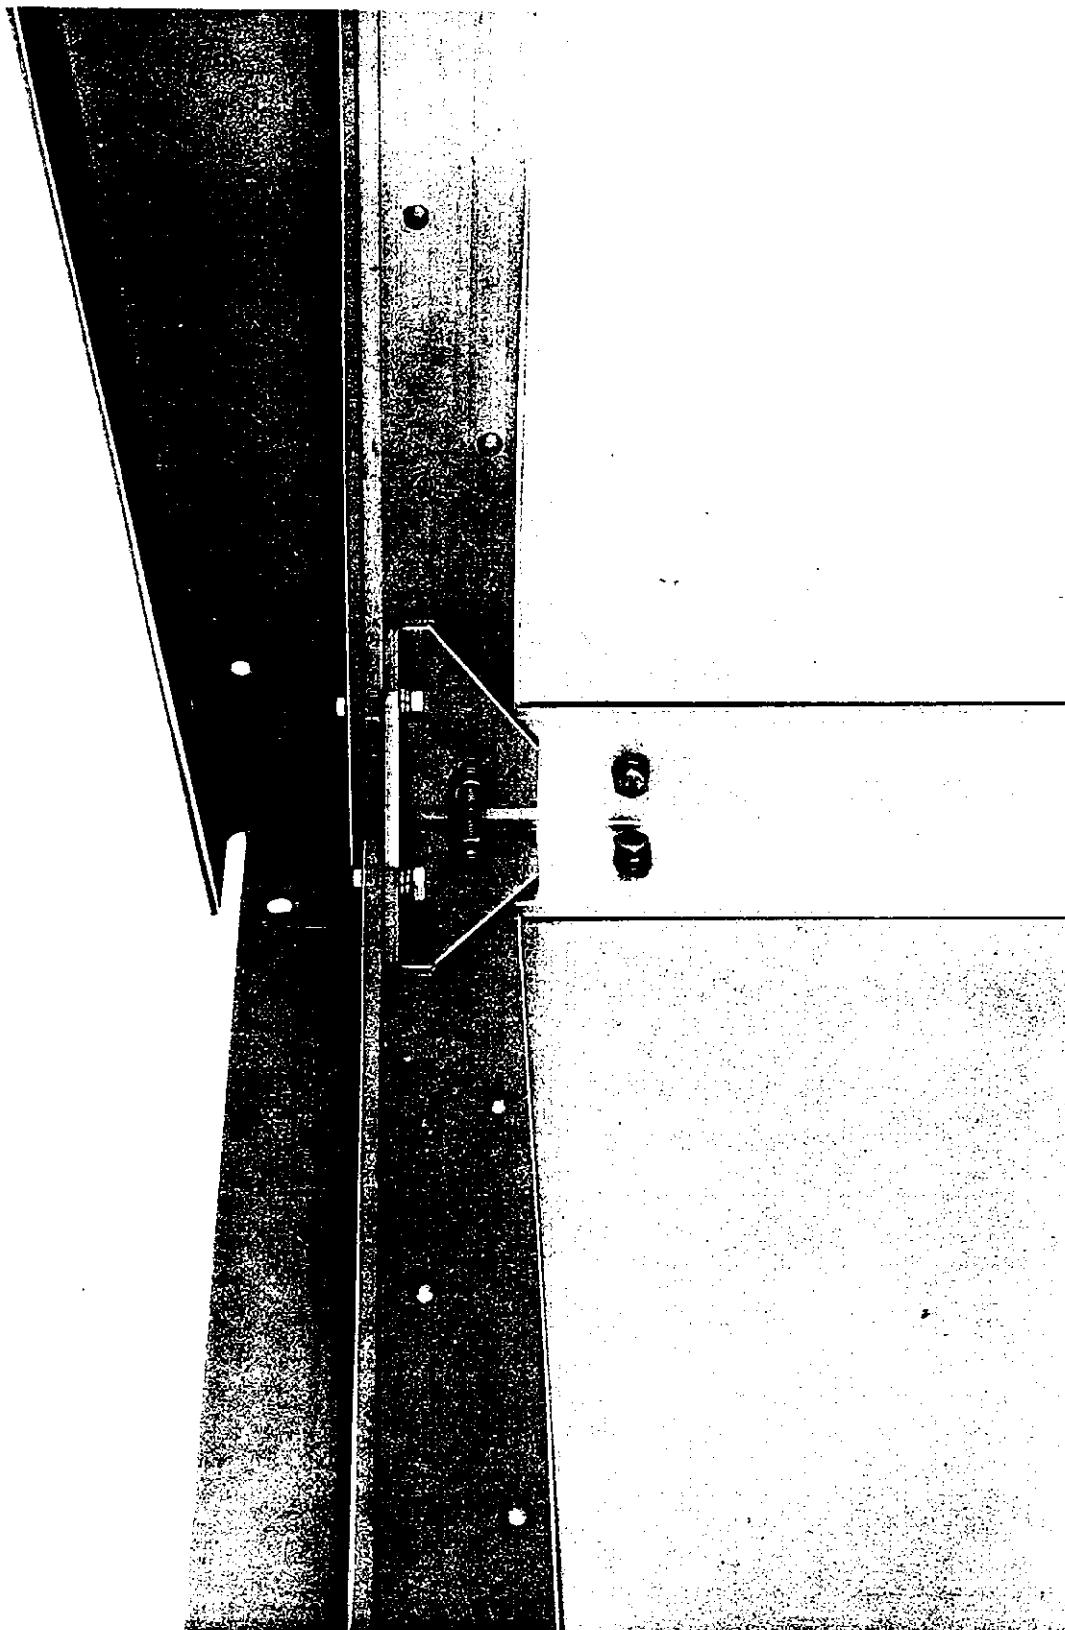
Enclosure, Truss Panel Corner Post Assembly Detail
